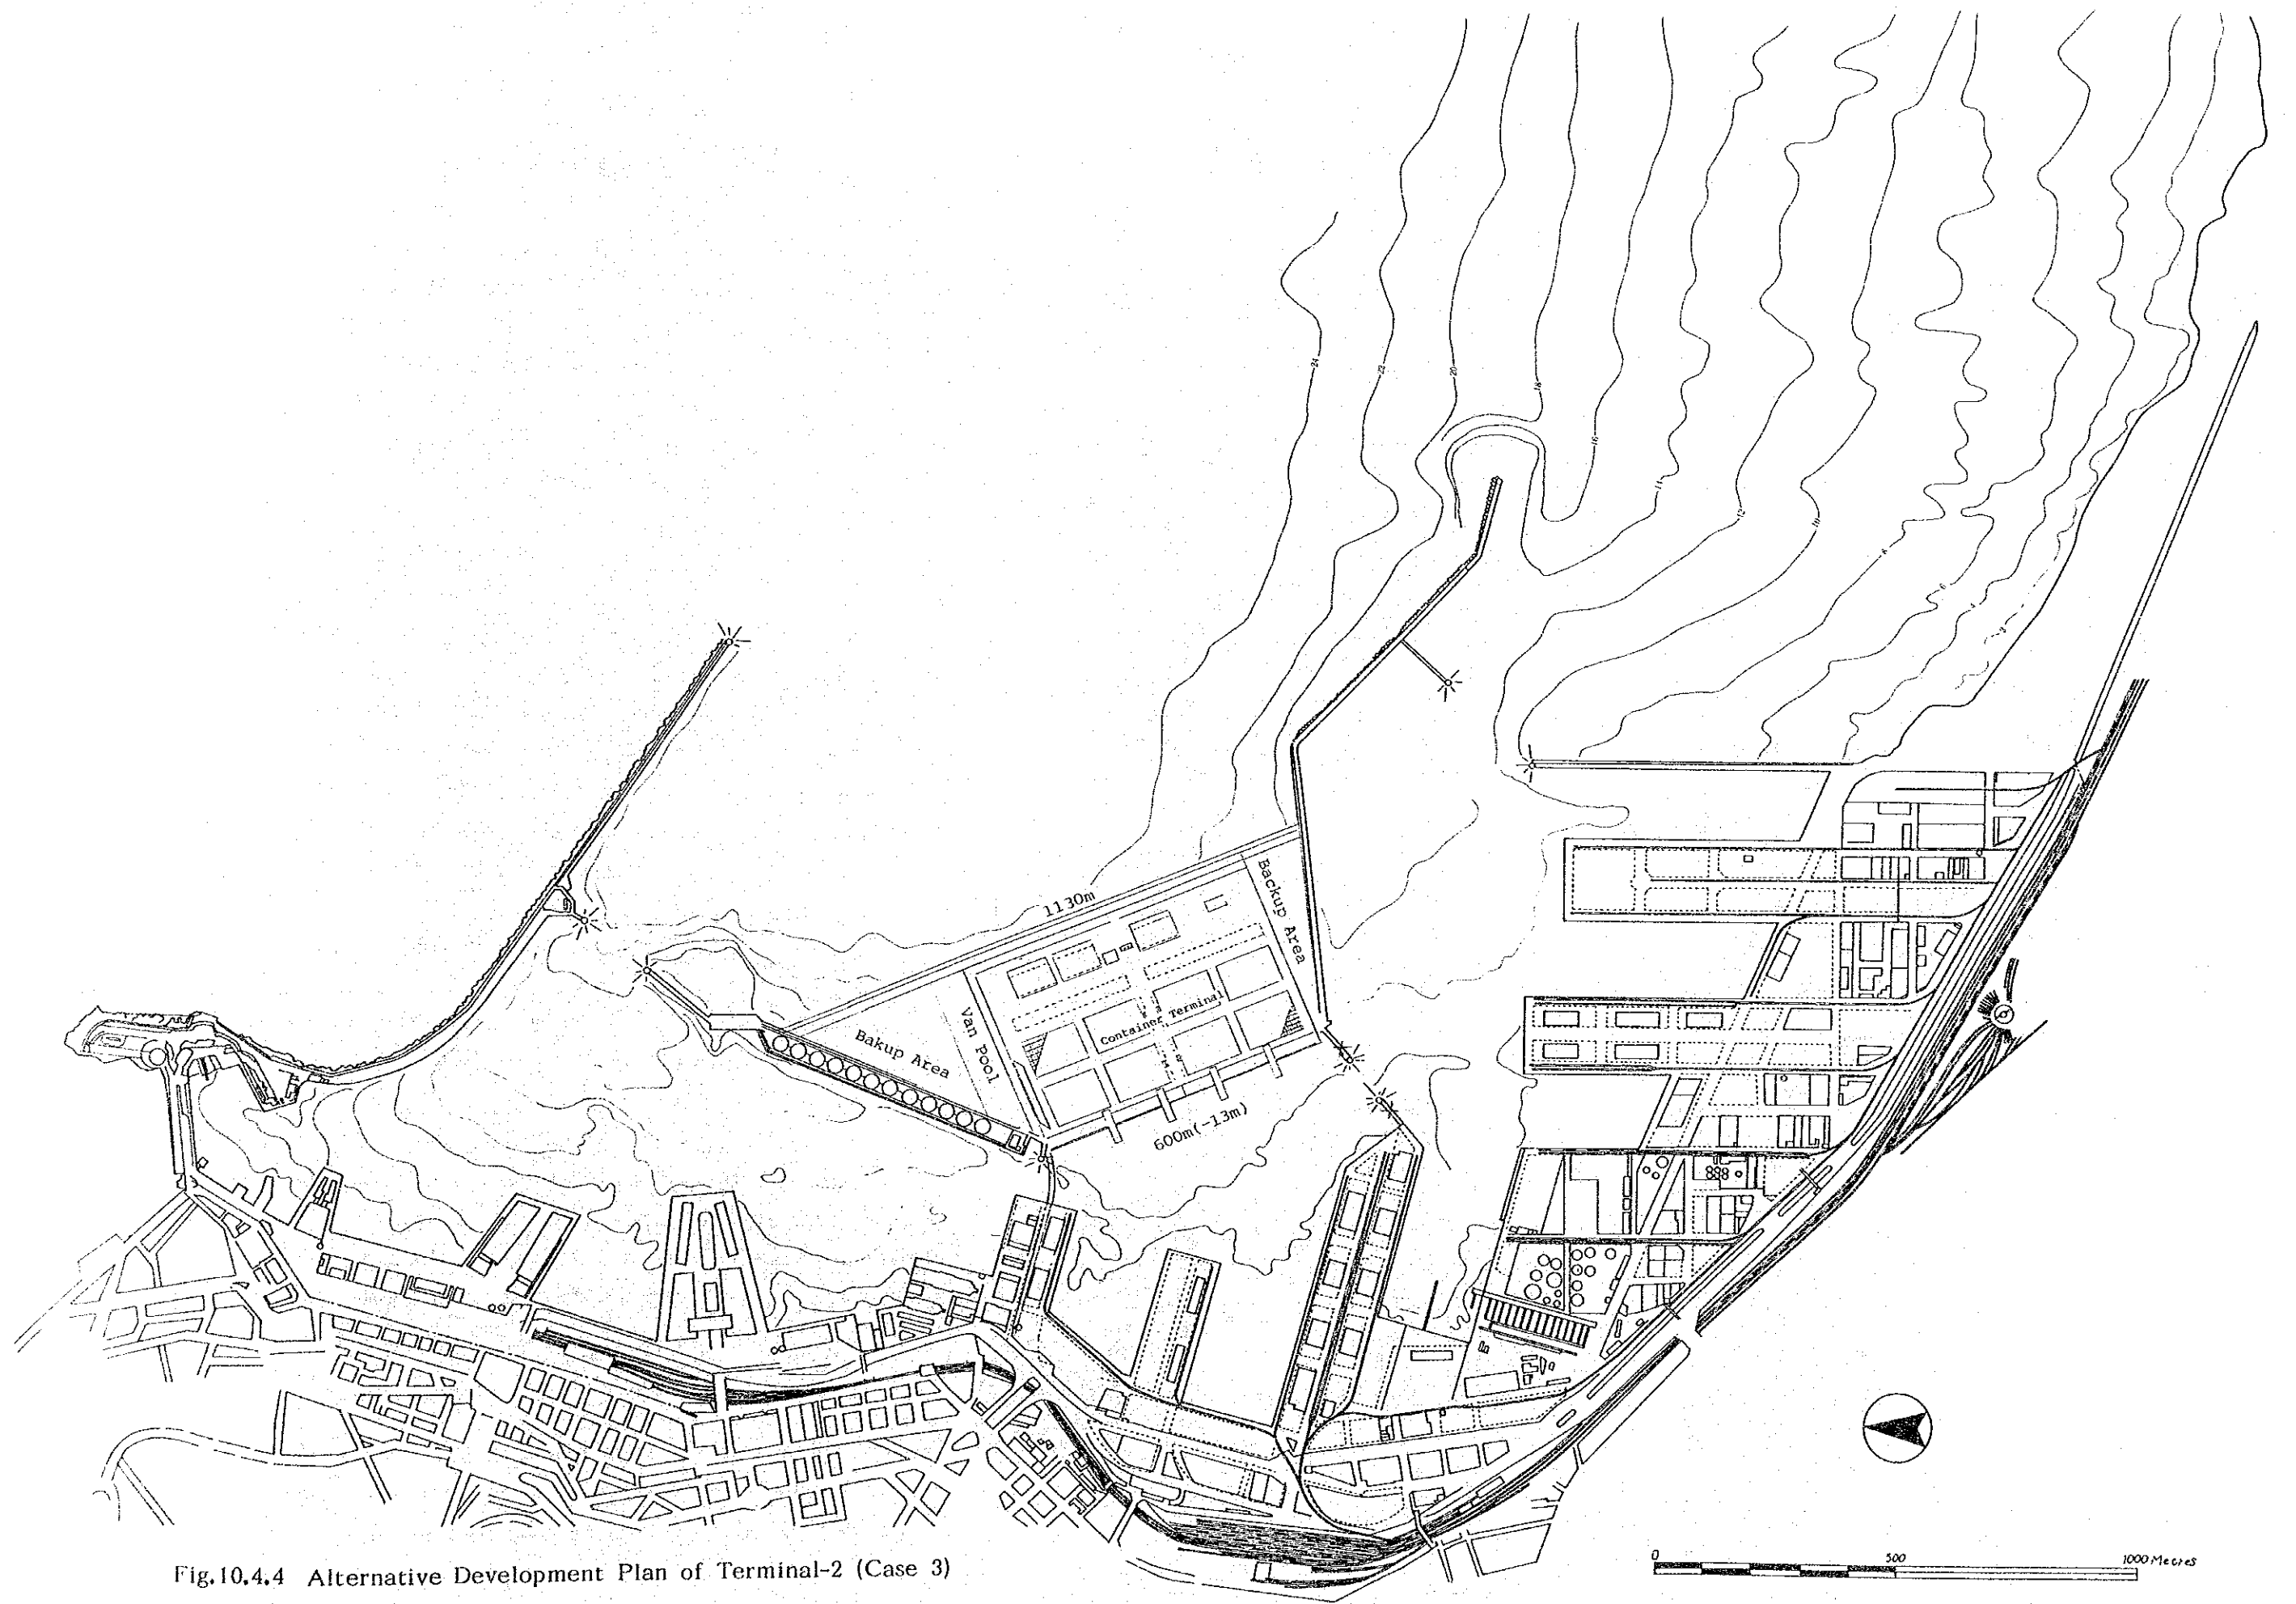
Alternative Development Plan of Terminal-2 (Case 3)
